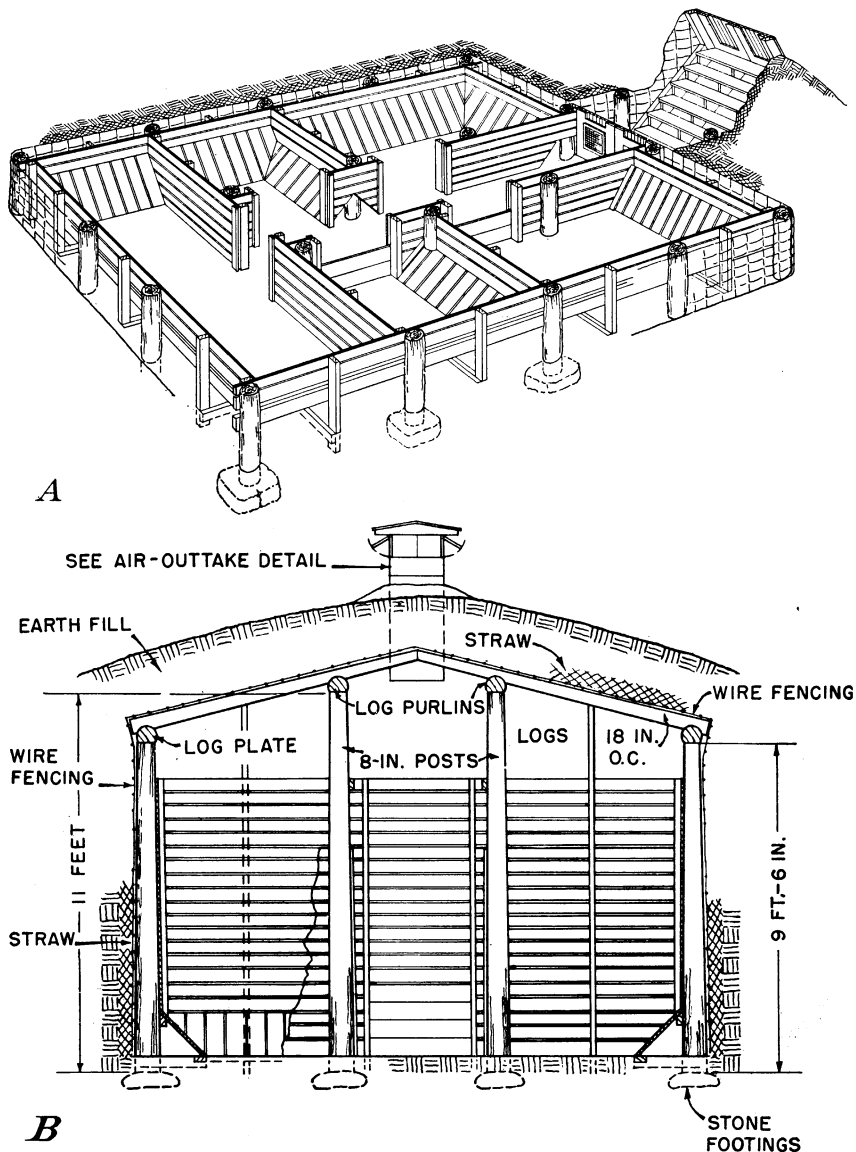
Cutaway perspective (A), and section (B), of a 1,200-bushel earth-covered storage adapted to a bank site. Exchange Plan No. 5491.
